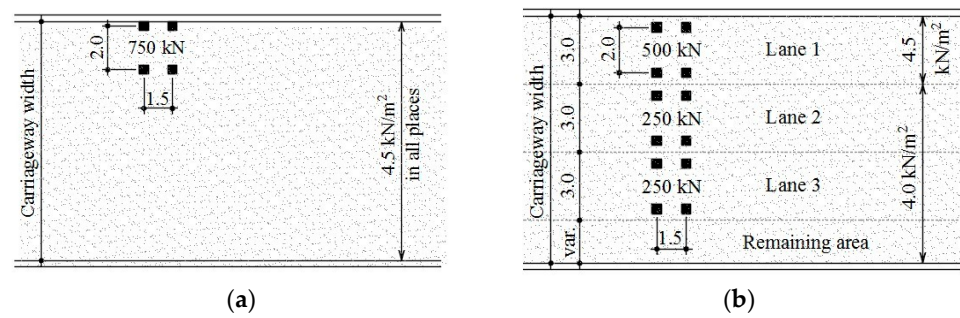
Plan view of the proposed load models: (a) load model 1; (b) load model 2. Units: m.
